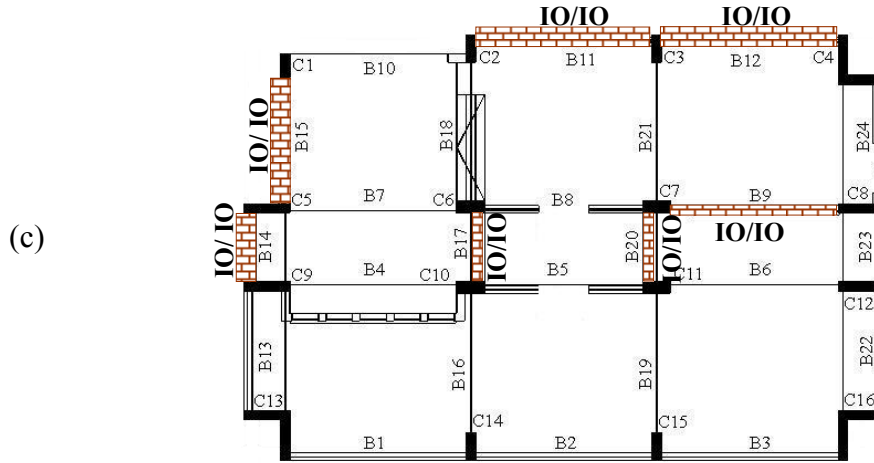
Cont'd Comparison of the observed and calculated damage of the ground story infill walls regarding the Bingöl building. (Observed Damage/Calculated Damage)
